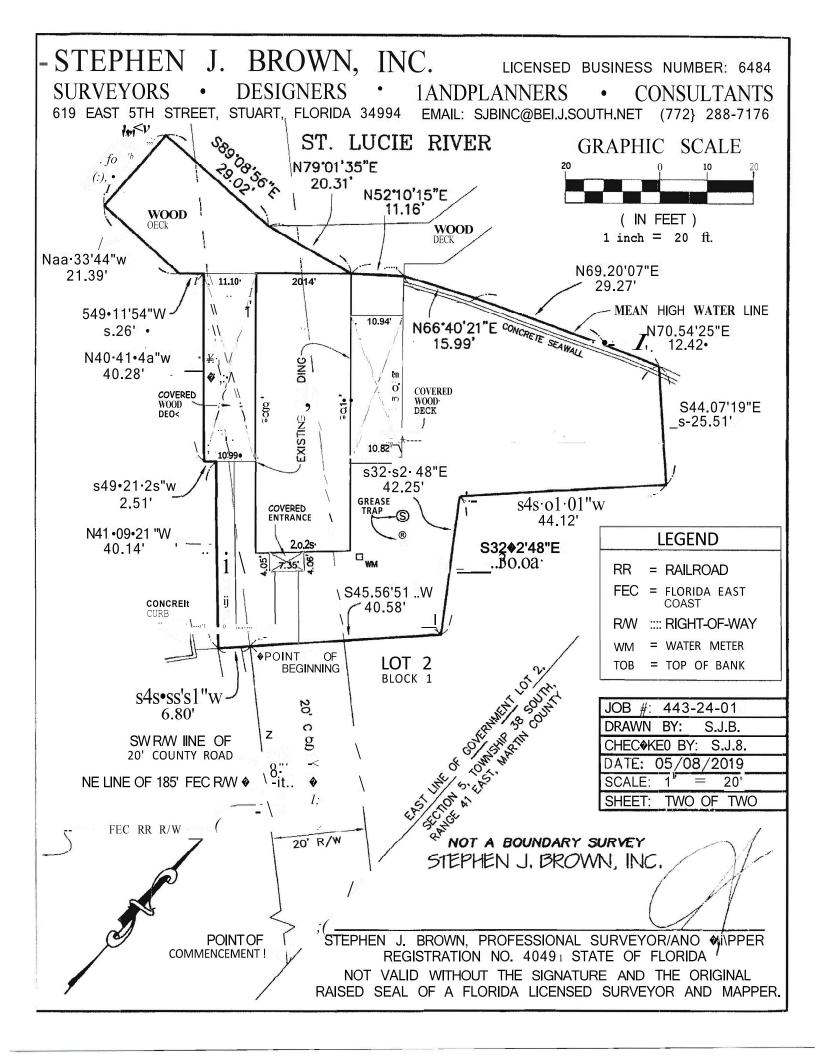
EXHIBIT B - IMPROVEMENT PLANS AND SPECIFICATIONS
